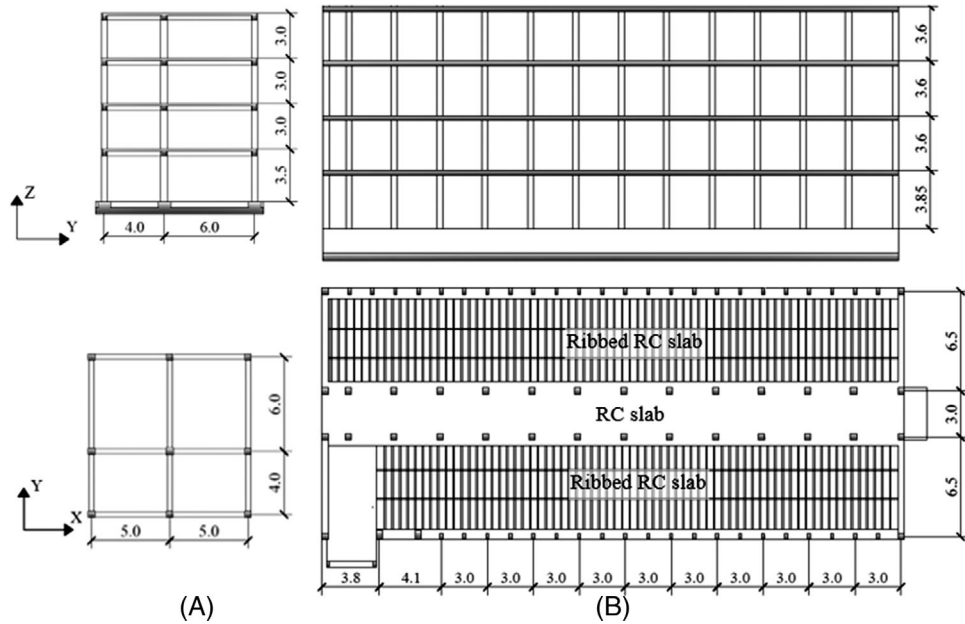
The elevation and plan views of (A) the office building and (B) the school building
